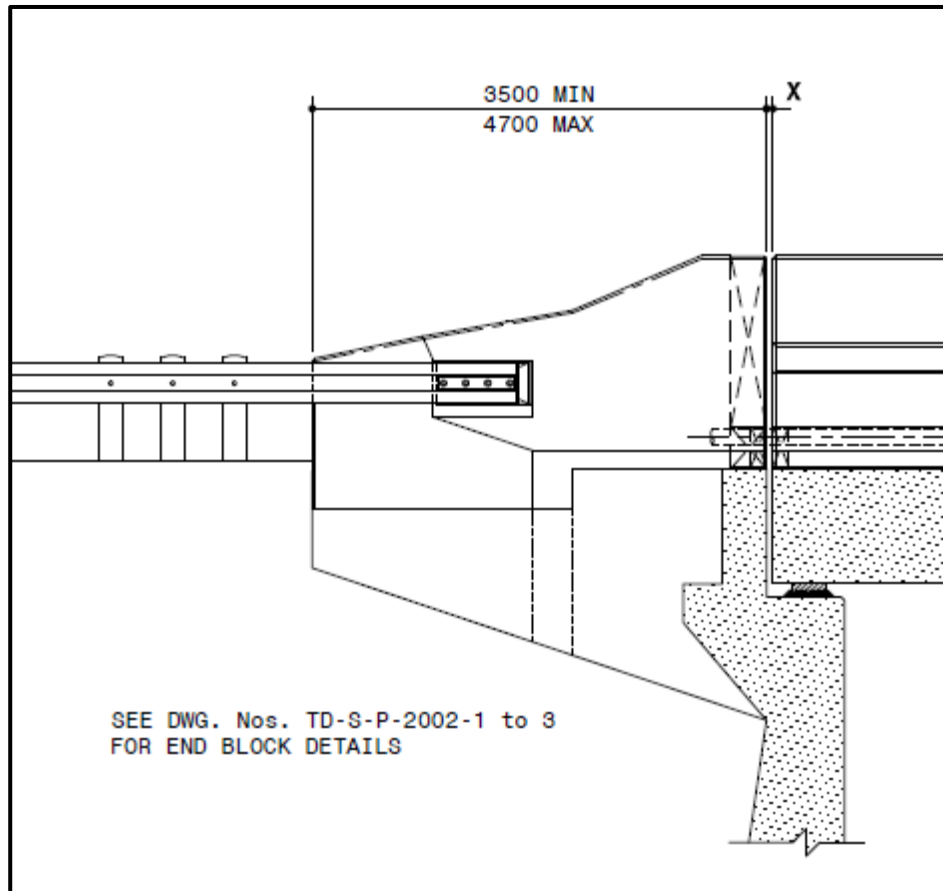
Transition Between Bridge Parapet and W-Beam Barrier
